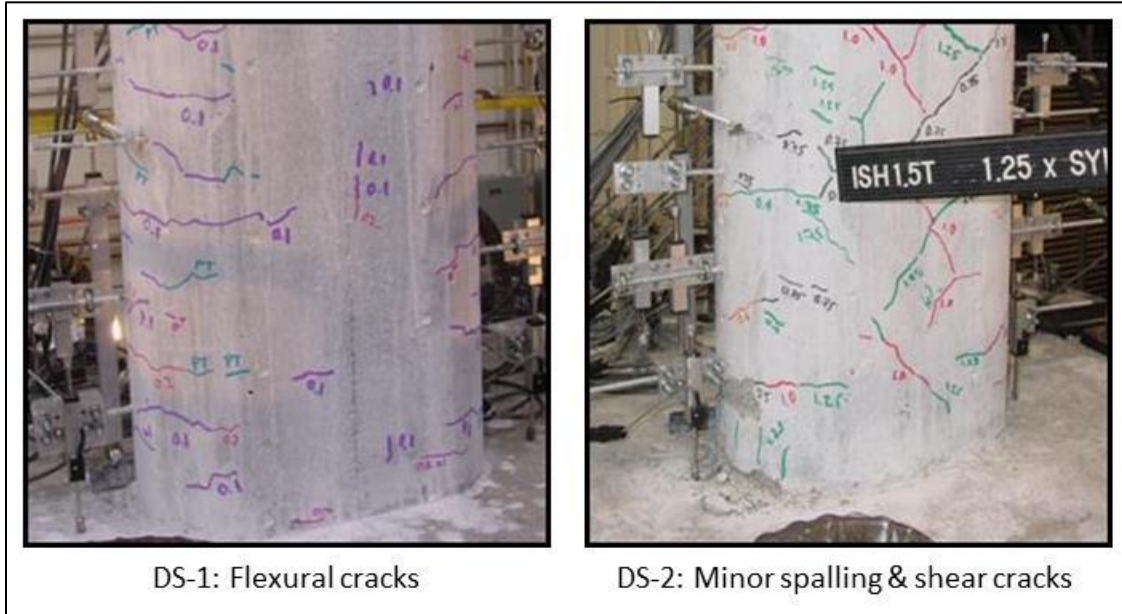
Damage States 1 and 2 - Apparent damage states in the RC bridge columns [20]
